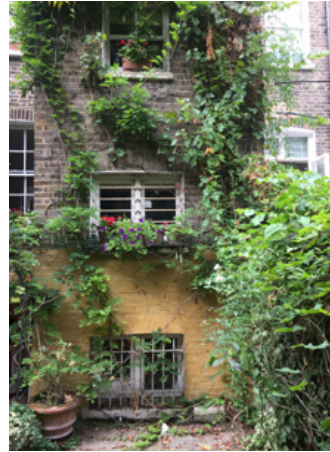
Looking back towards the rear elevation of the closet wing extension.
